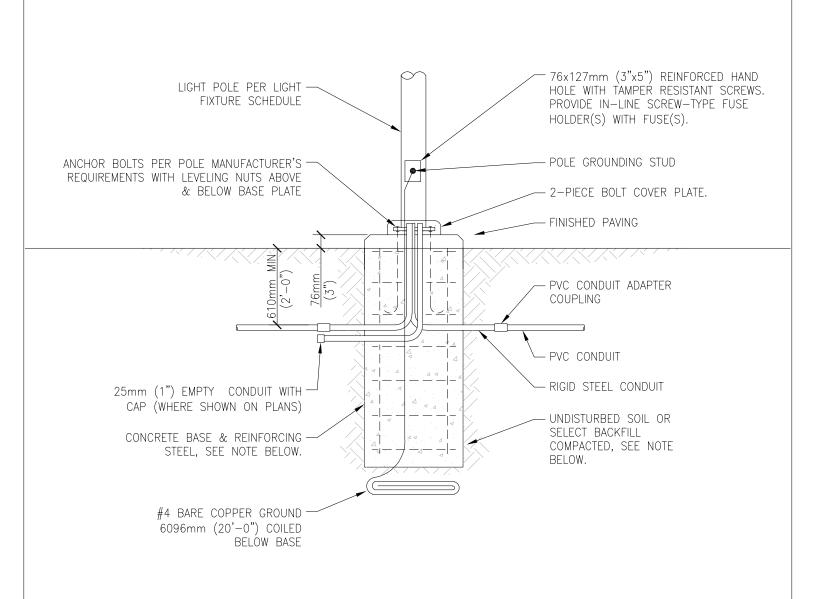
DETAIL TITLE / POLE BASE DETAIL - PAVED AREAS
